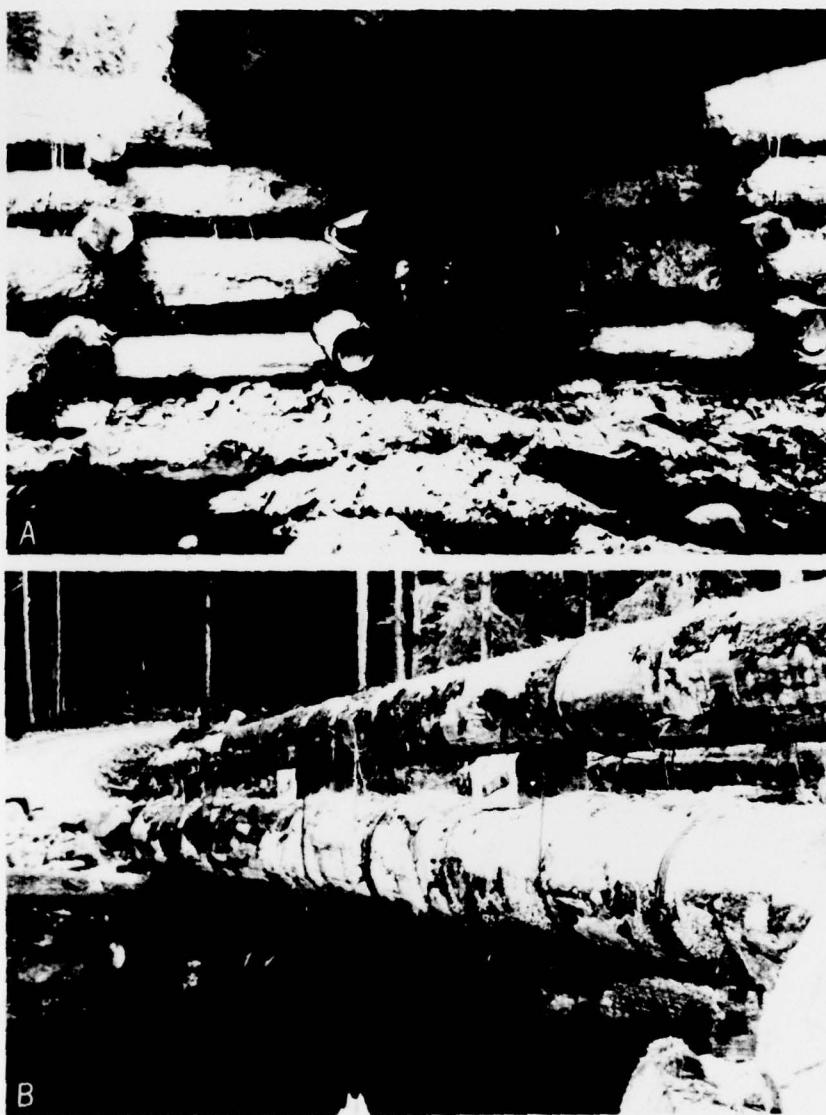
Log stringer bridges. A—large log stringers are simply placed on log crib abutment. B—bridge with spread braw logs; this bridge spans nearly 100 feet and is designed for 80-ton off highway logging trucks. (M 143 536) (M 143 751-16)
